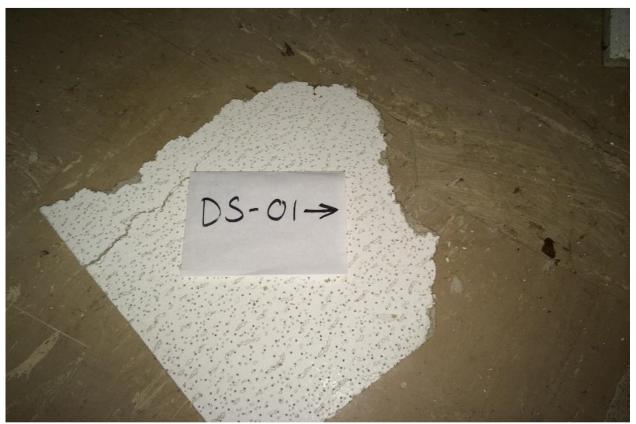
Laboratory analyses did not detect asbestos minerals within suspended ceiling tile sample DS-01 collected from the Dormitory Building upstairs central room.
